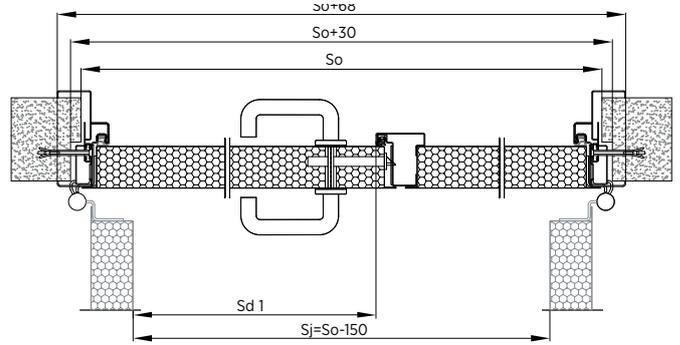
Installation of the double-leaf door to a masonry wall - wrap-around frame with a thermal break - horizontal cross-section
